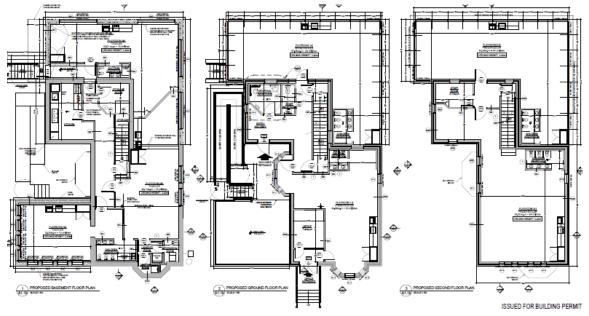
Floor Plans, Phase 2 Armstrong House Daycare (AREA, Aug. 20, 2024)
